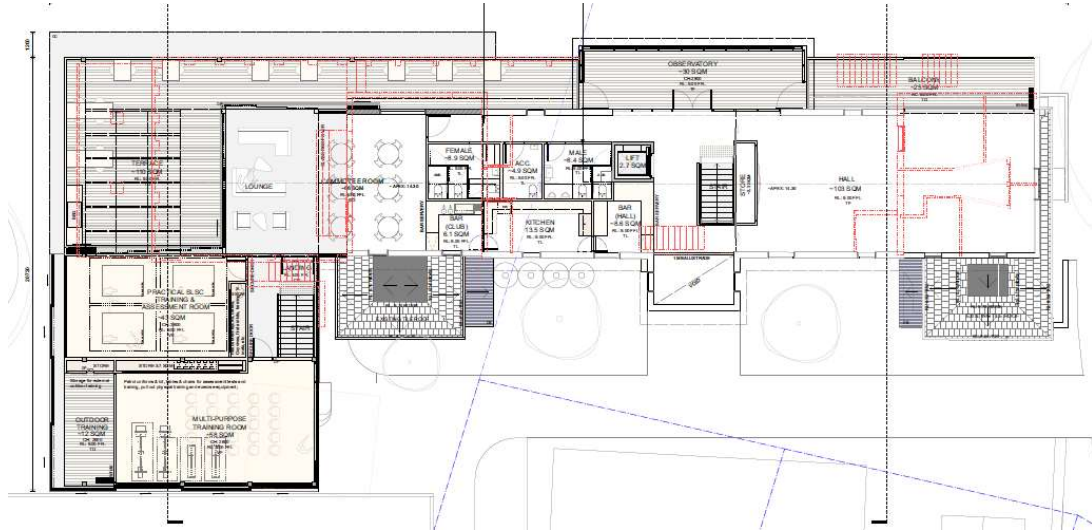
Proposed First Floor layout. No structural augmentation required for upper levels of the building. (Source: Adriano Pupilli Architect)
